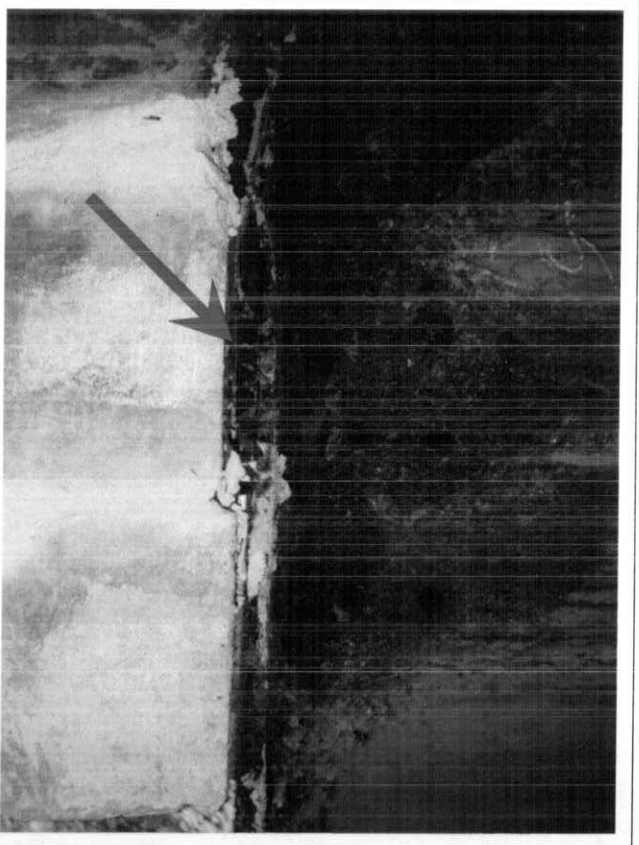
CRIBBING UNDER BEAM 5 IN SPAN 1 AT PIER.
